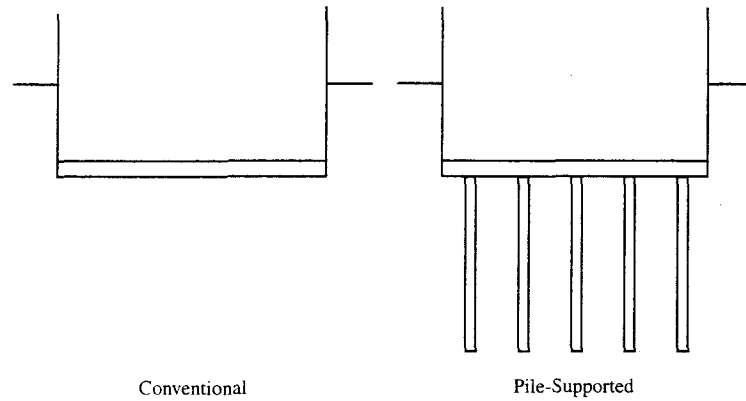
A conventional mat foundation and a pile-supported (or pile-enhanced) mat foundation.
